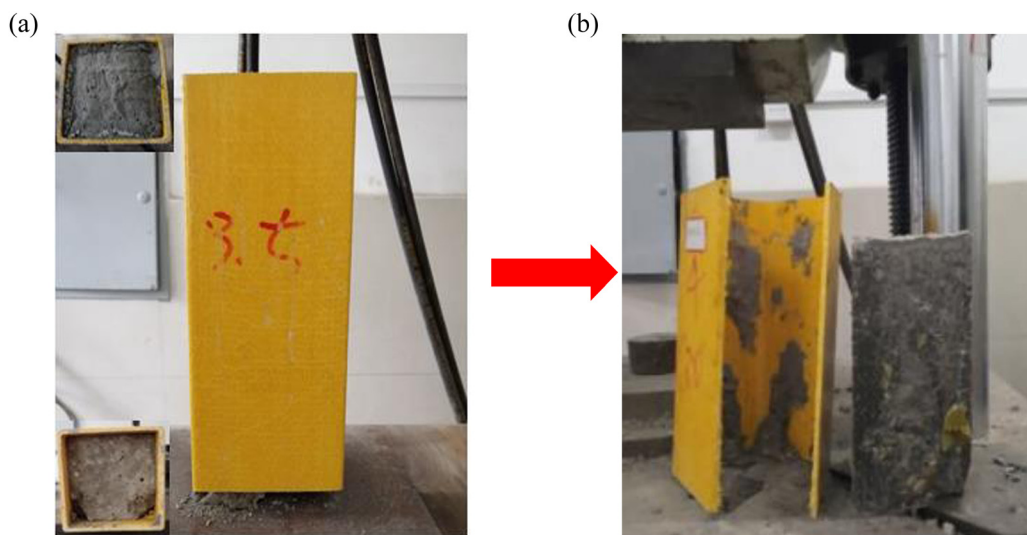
Failure process of specimens: (a) before loading and (b) after loading.
